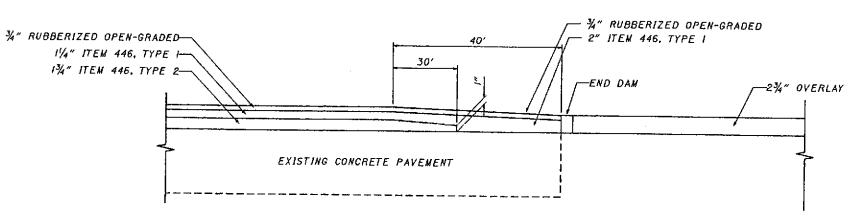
, MAINLINE TRANSITION UNDER 0414 (STEEL ST.)
